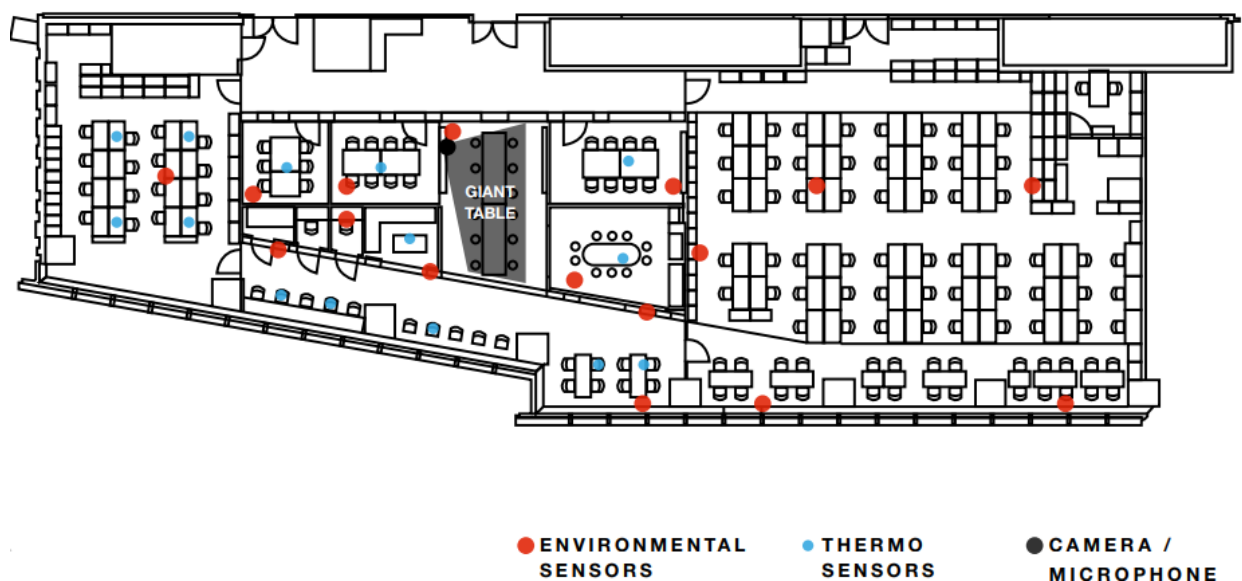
Layout of the Arup office in Tokyo with installed sensors (ARUP, 2019).
